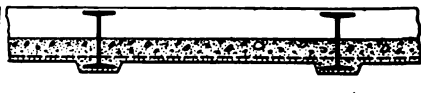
Monier Slab Carried on Bottom Flanges of Beams.
